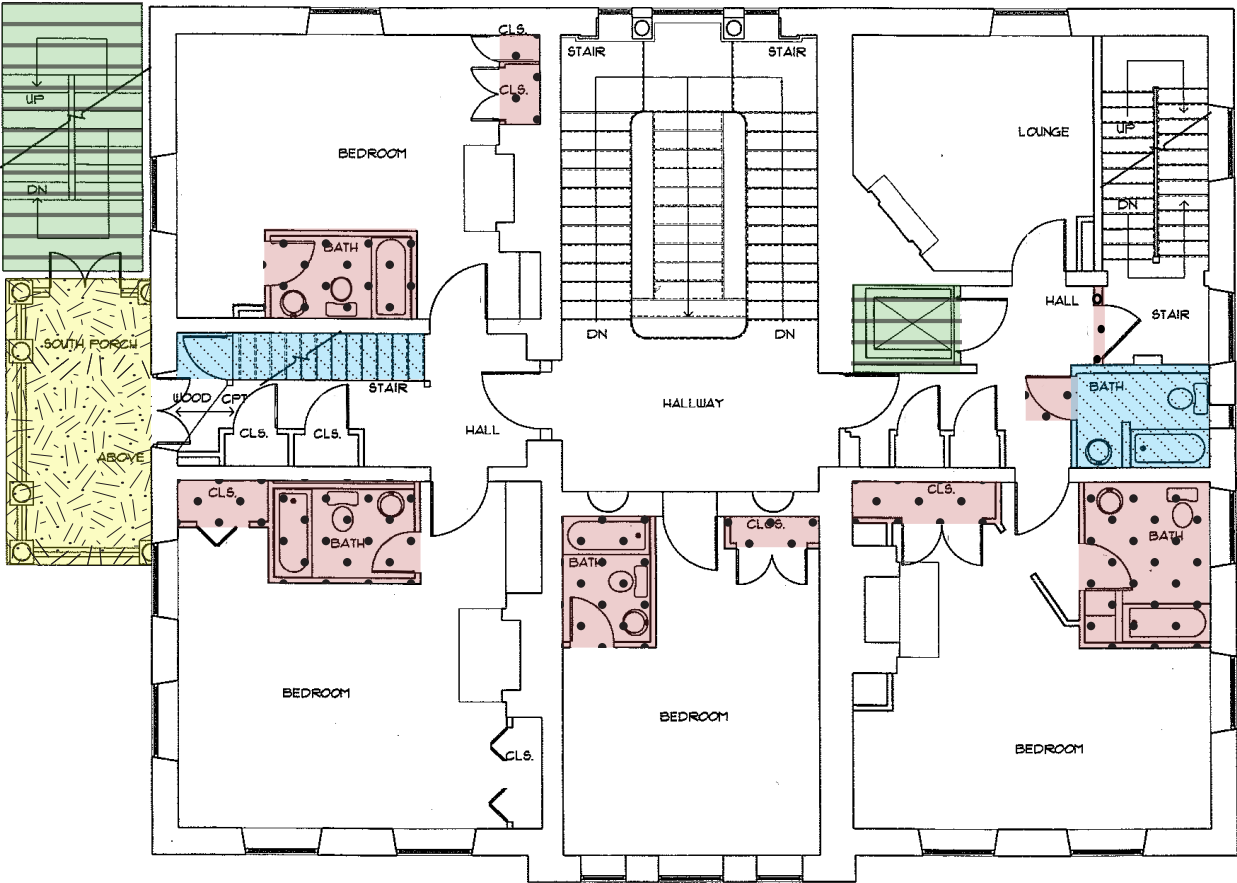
Chase-Lloyd House second floor plan, edited from John Milner Conditions Assessments Drawings, Dec. 2000, Fall 2015
